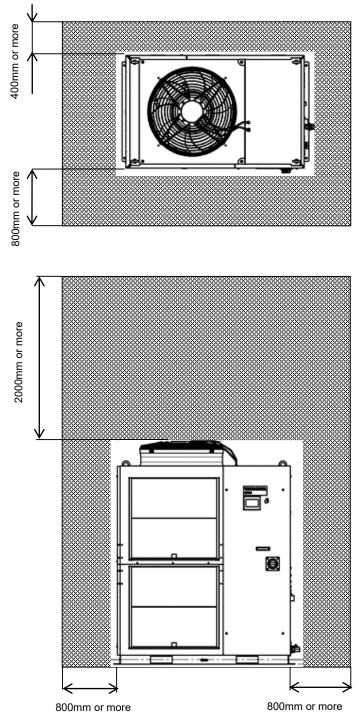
Installation space (This drawing shows "HRS400-A-46")
